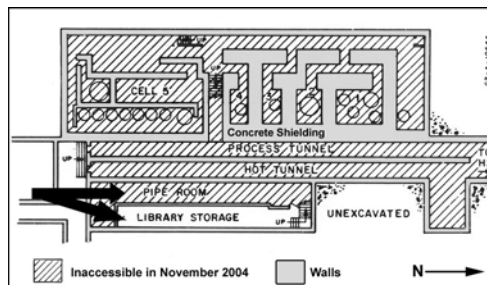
Building G2, Basement, 325-Foot Level, Pipe and Motor Generator Room
